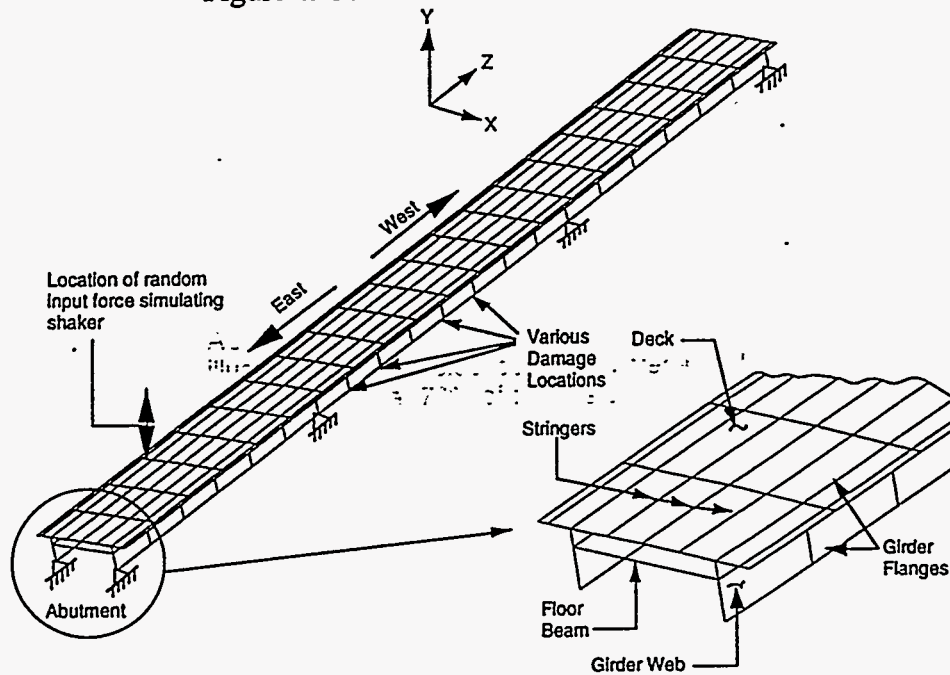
Finite Element Model of the I-40 Bridge (Piers Neglected).
